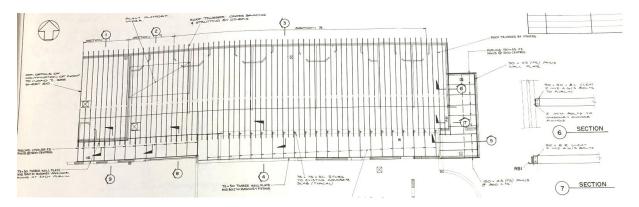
A Part Roof Plan of the Eastern End of Stage 3 Showing Timber Roof Trusses
